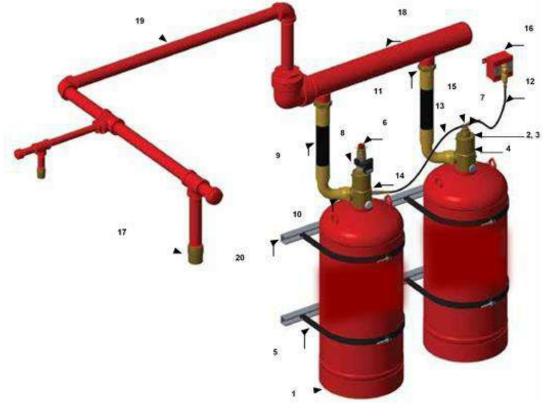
TYPICAL MANIFOLD SYSTEM: Part No. 300010
